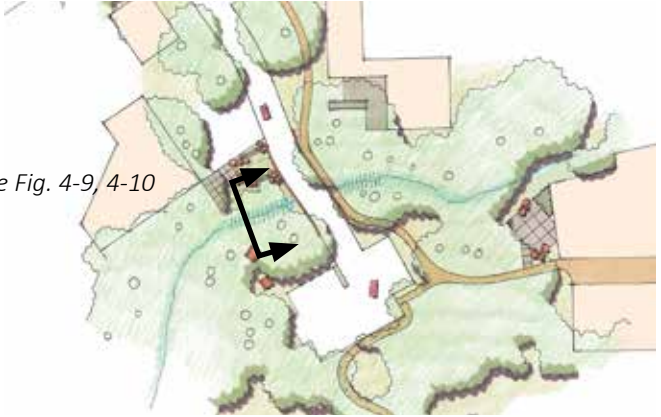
Plan View - Restore natural creek by removing culvert under a portion of the parking lot
